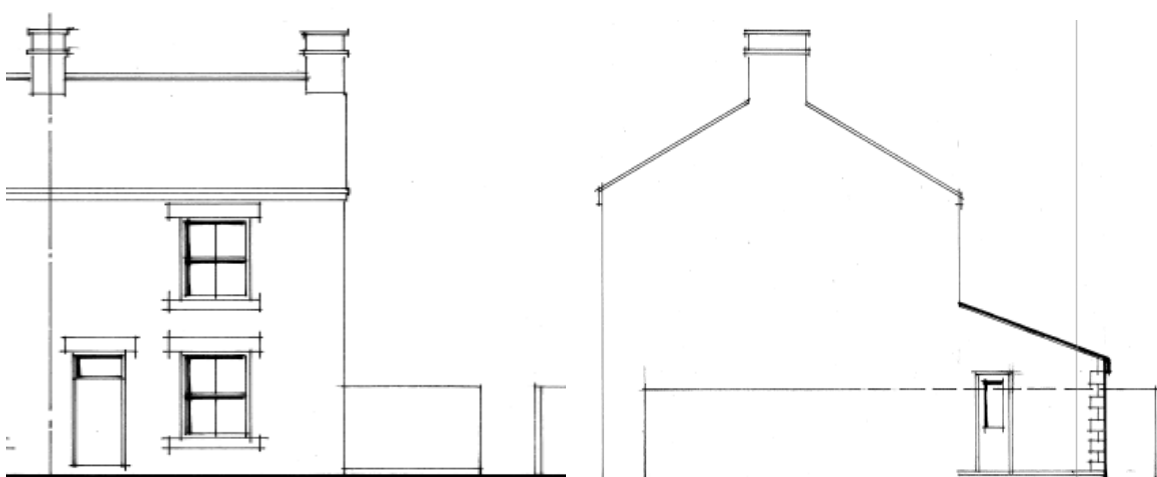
Proposed Front Elevation (top left), Proposed Side Elevation facing No.5 Chapel Fields (top right).
